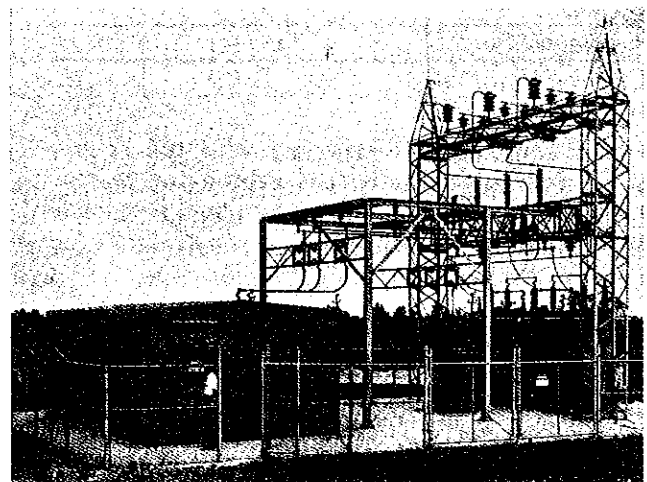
15 KV Shelter-Clad Switchgear Installation
